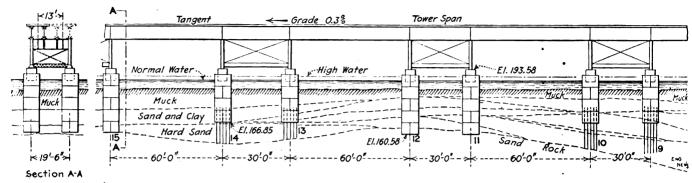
PLATE GIRDER BRIDGE WITH STEEL TOWERS ON CYLINDER PIERS AT BUFFALO LAKE, WISCONSIN; CHICAGO & NORTHWESTERN RY.
